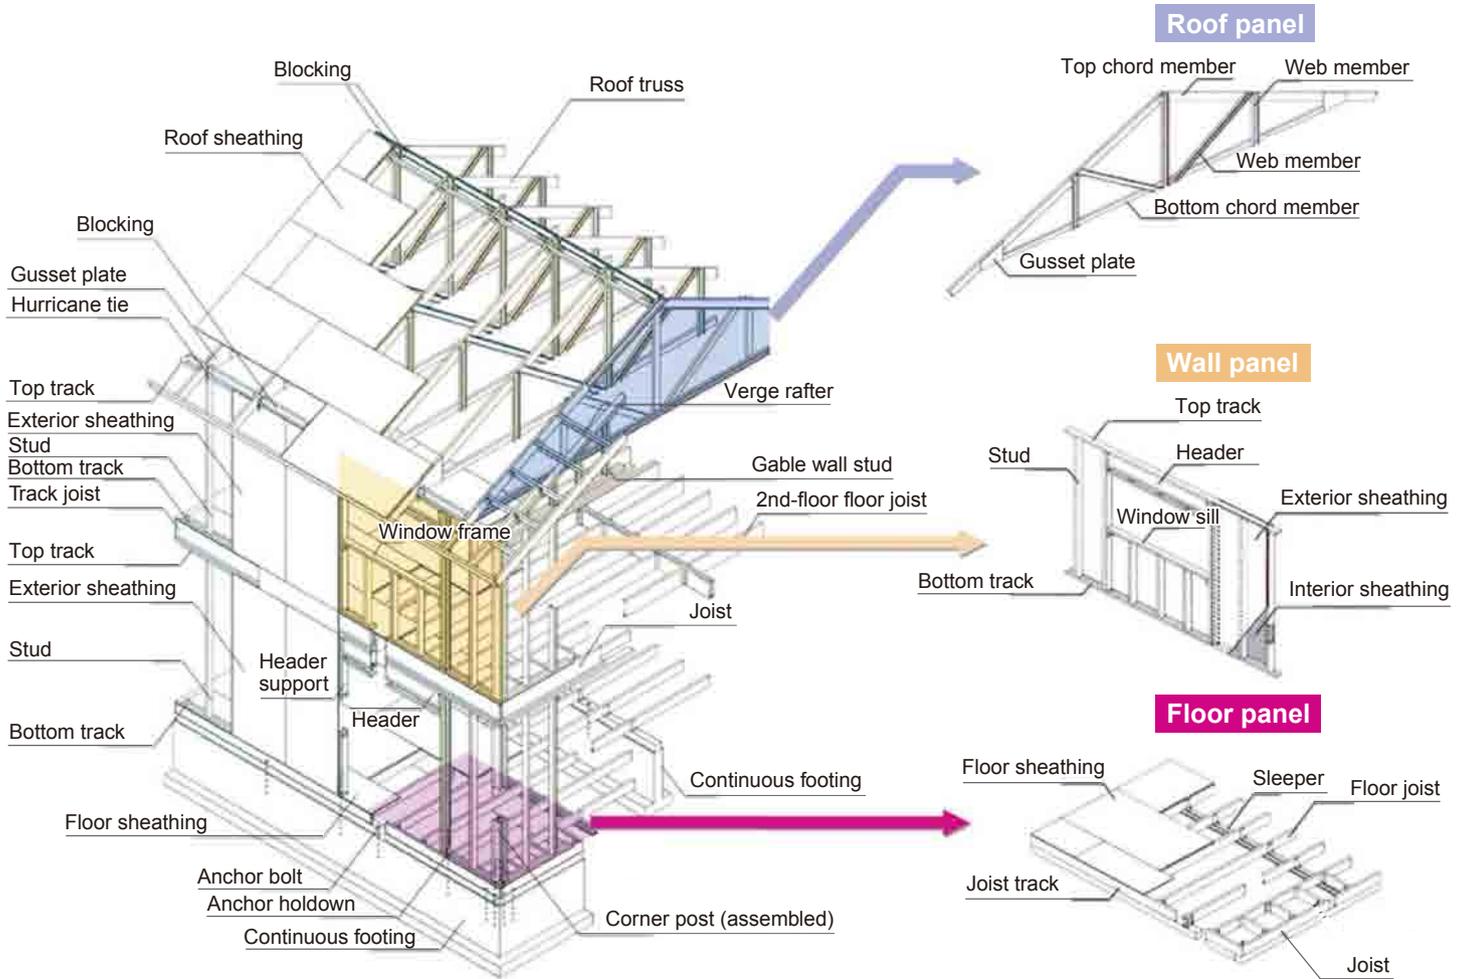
Framing of steel-framed house employing light-gauge steel shapes
